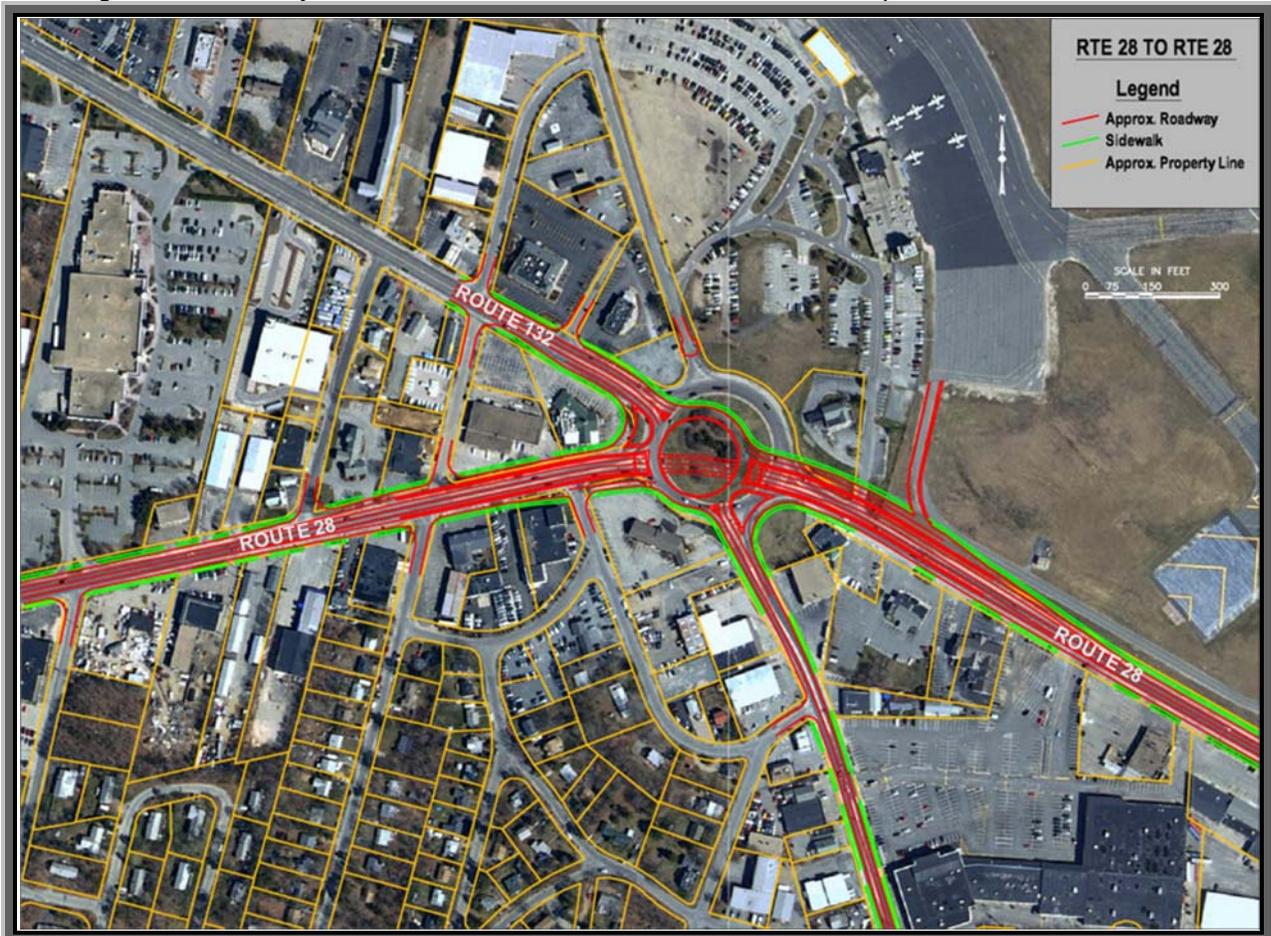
Rotary Alternative 4 – Route 132 to Route 28 Underpass with Roundabout
